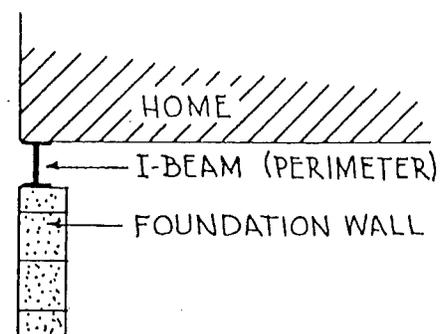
The I-beams of a perimeter frame rest on the foundation wall.
